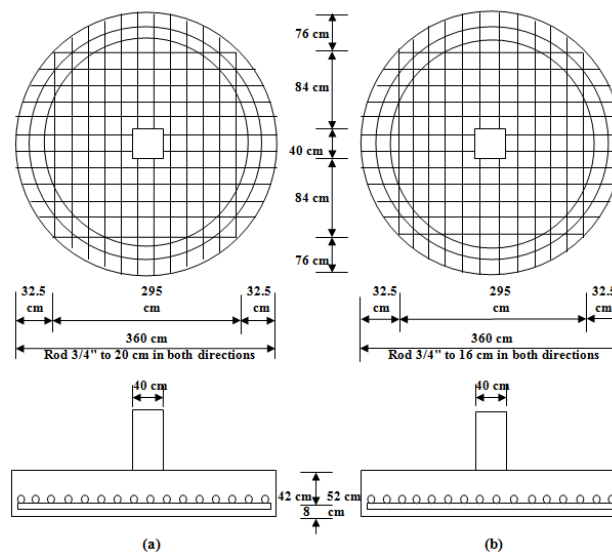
Isolated footing in plant and elevation: (a) New model, (b) Classical model
